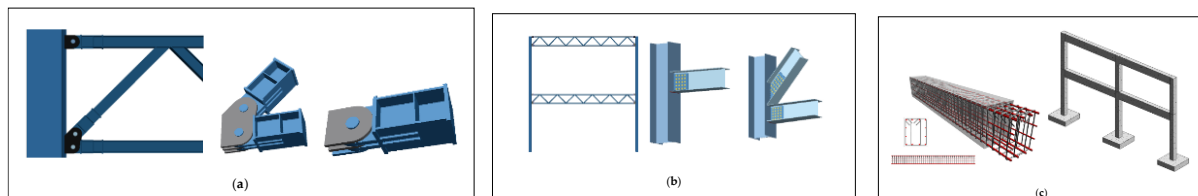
Structural system. (a) Pin connection for a long-span steel structure; (b) traditional connections for a long-span steel structure; (c) traditional concrete structural system
